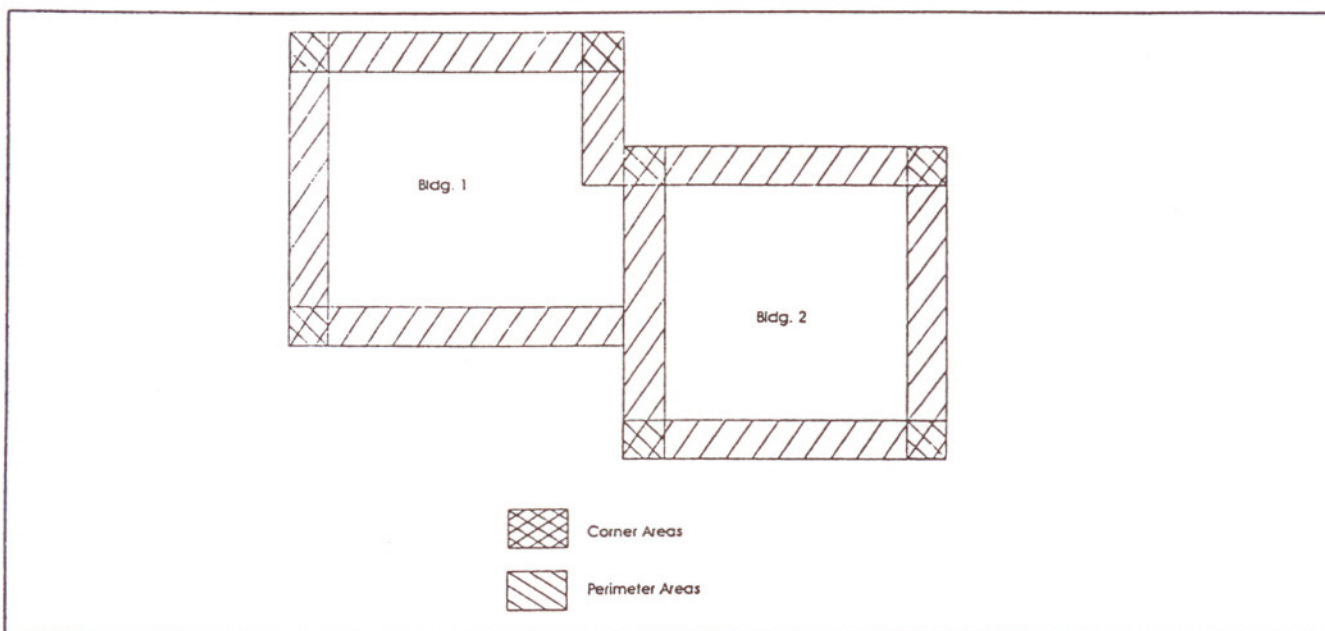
Building 2 is more than 3 ft (0.9 m) higher than Building 1.
